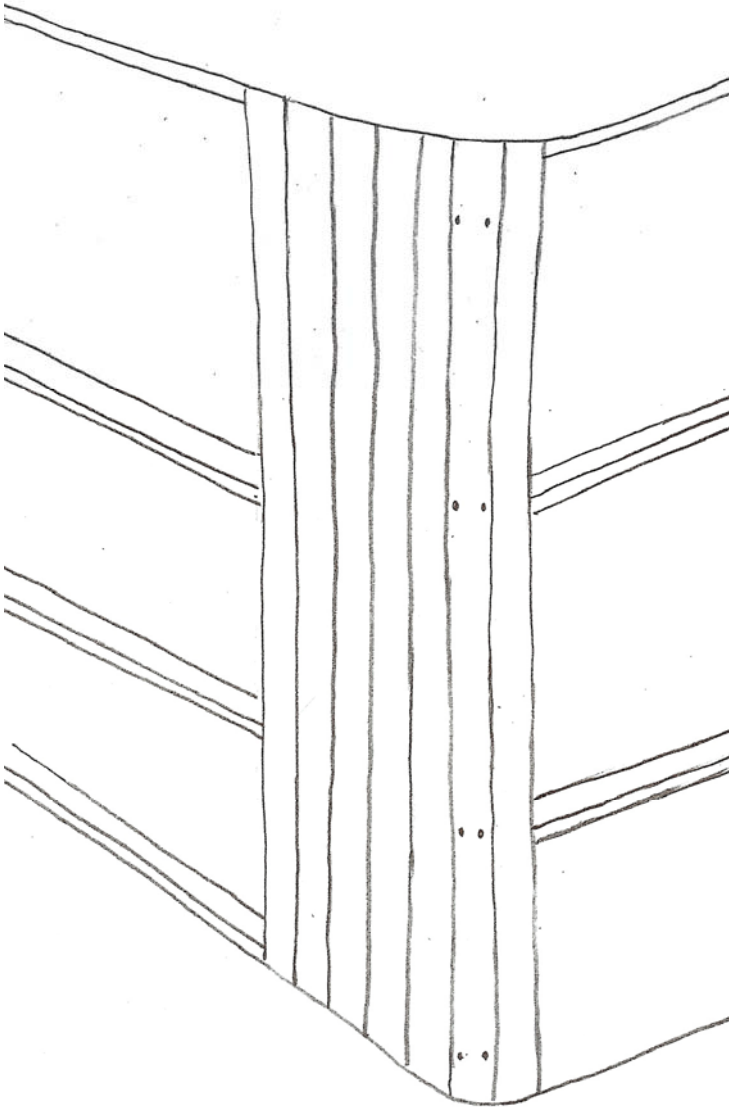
Sketch artist Steve Daniel documented the completed corner task showing the screws added to fasten the corner piece to the backing boards.
